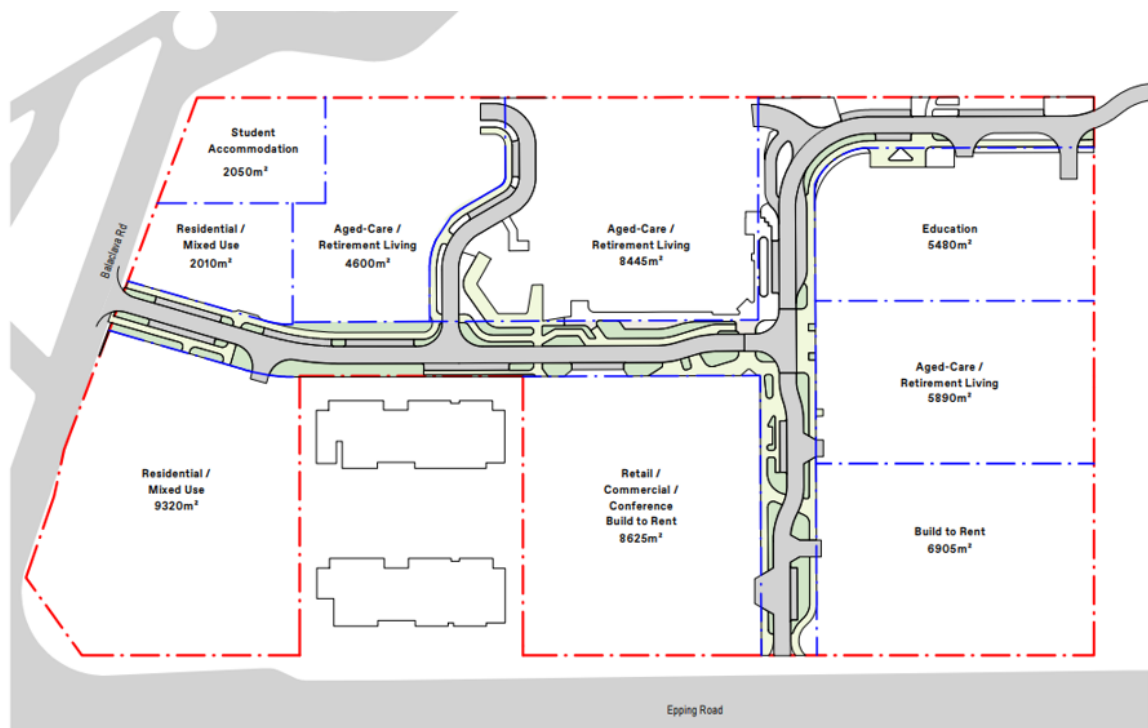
Proposed Land uses (Source: Architectural Drawing Set, Page 1)
